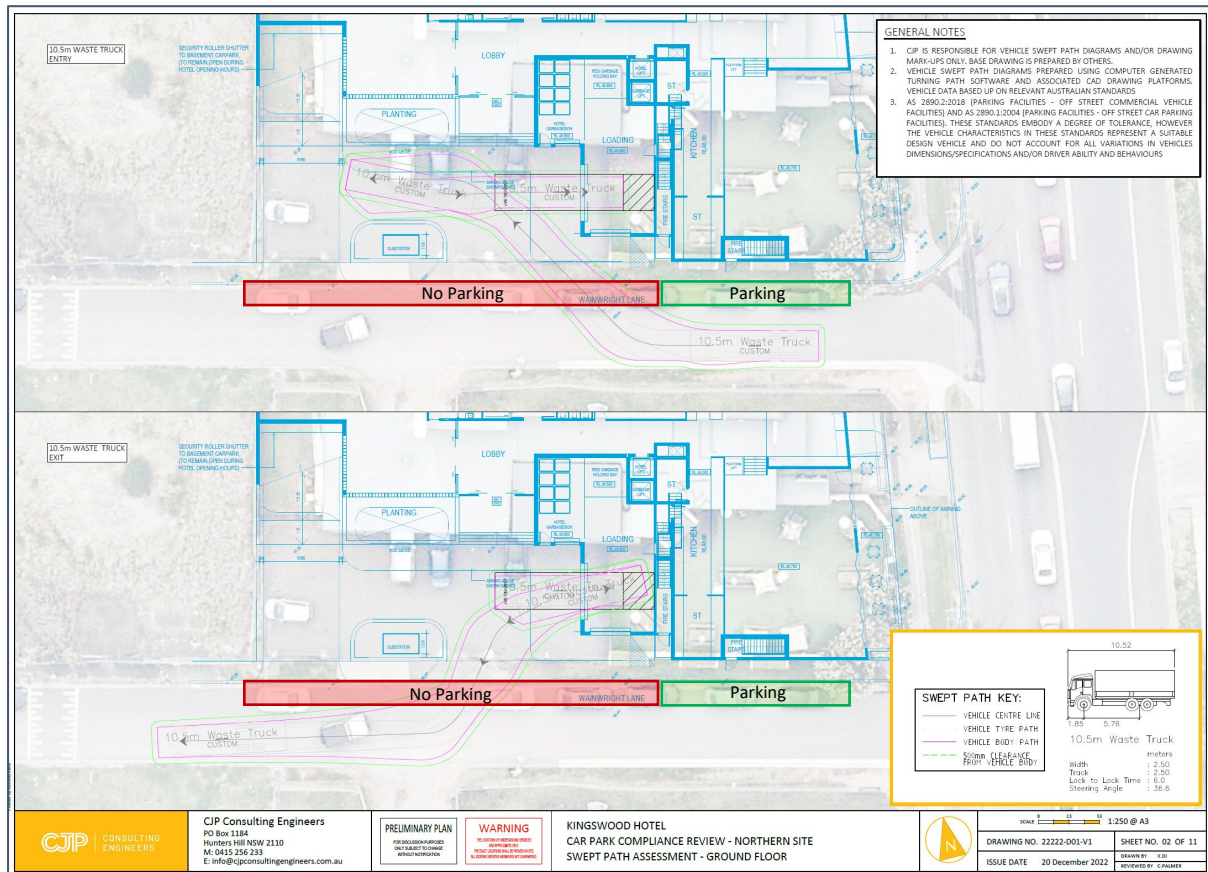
Option 1: On-site loading with required on-street parking restrictions in Wainwright Lane
